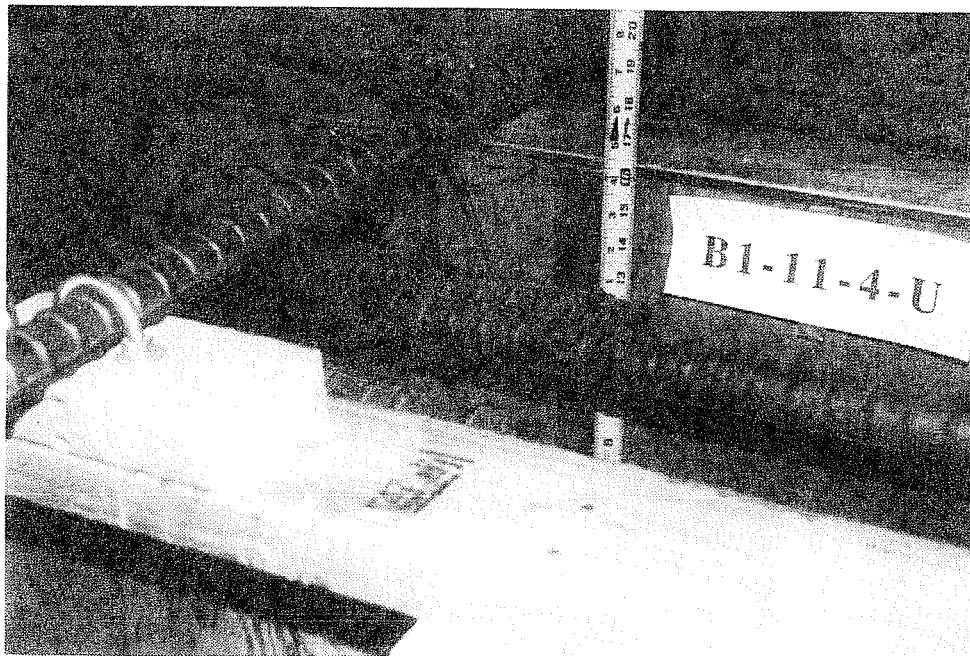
Steel layout of beams B9, B10, B11 and B12.
